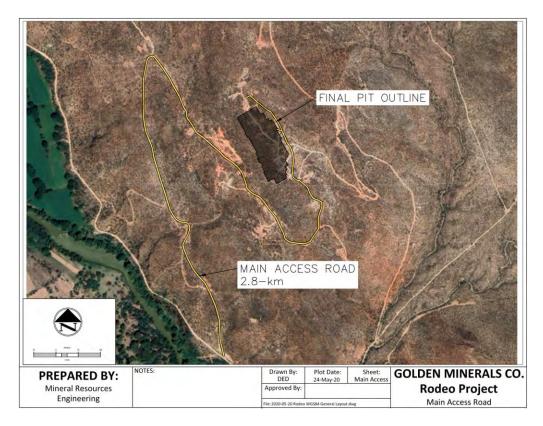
ACCESS ROAD FROM MAIN HIGHWAY
